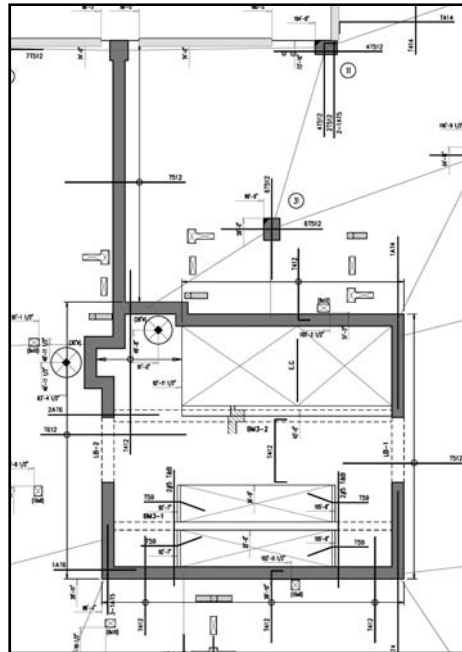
Typical reinforced concrete shear walls located around the building's elevator and stairwell cores
